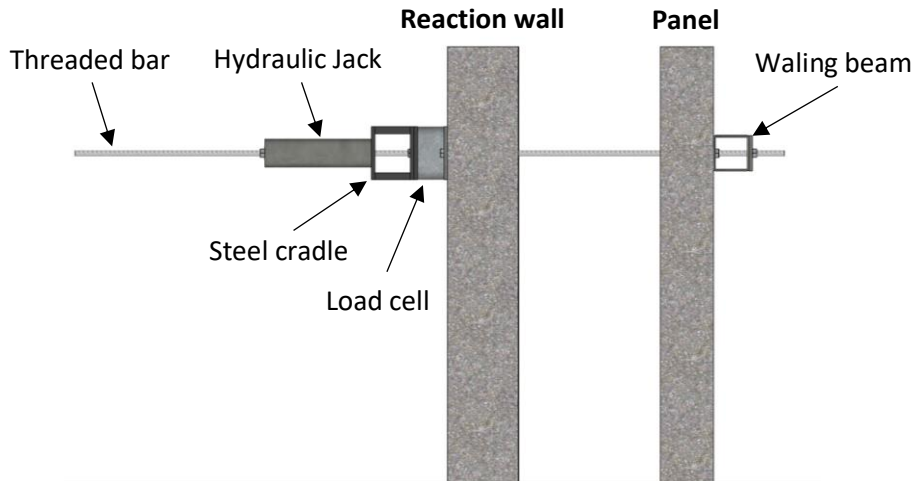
Loading arrangement through reaction wall and trial panel.
